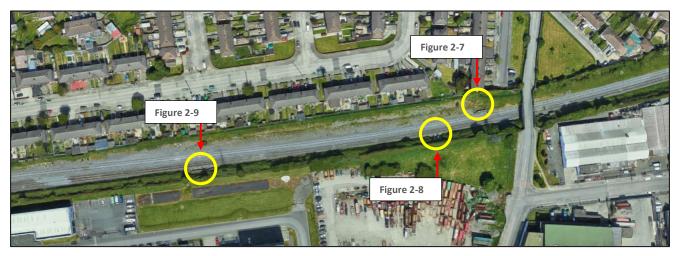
Aerial view to the east of section with minor retaining structure locations identified
